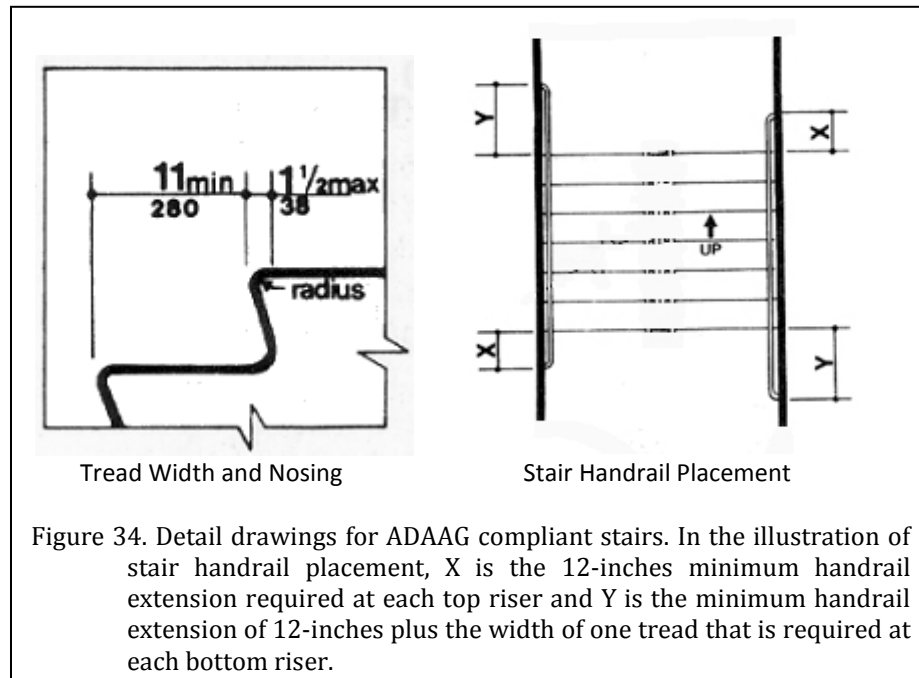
Detail drawings for ADAAG compliant stairs. In the illustration of stair handrail placement, X is the 12-inches minimum handrail extension required at each top riser and Y is the minimum handrail extension of 12-inches plus the width of one tread that is required at each bottom riser.
